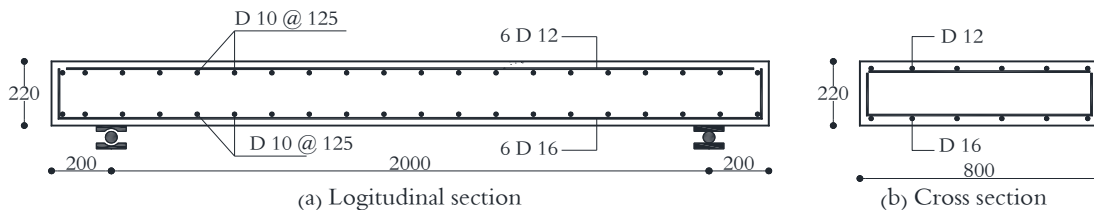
Concrete dimensions and reinforcement detailing of control specimens SN _{0.68%,0.}
